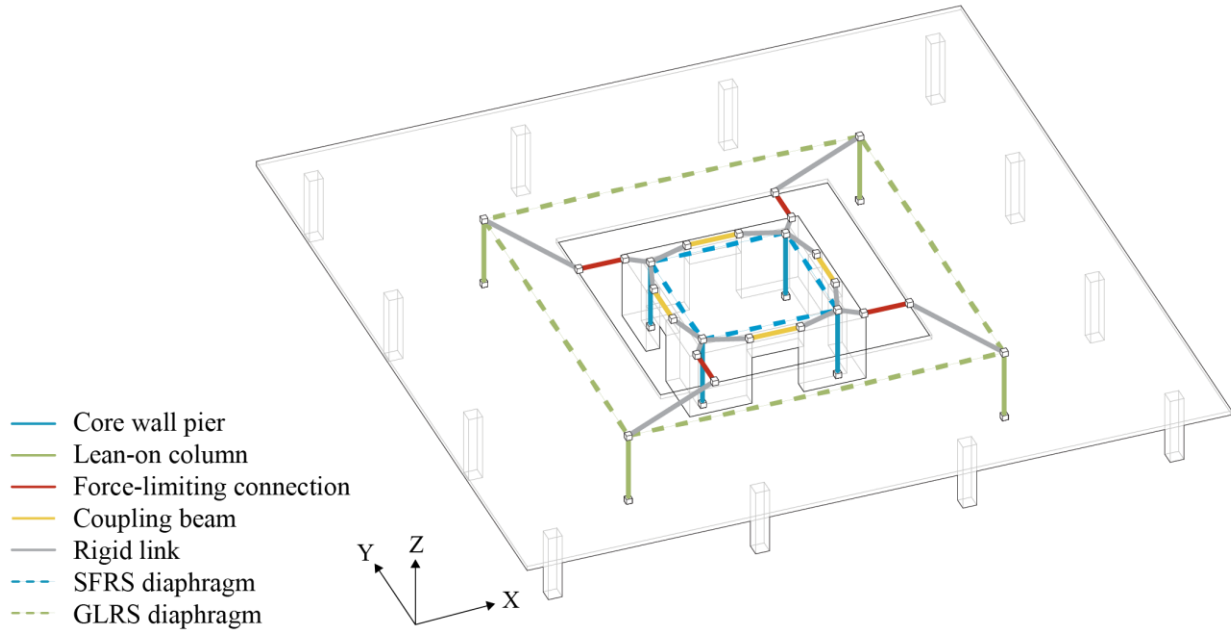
Openses model of the eighteen-story building and the elements of a typical floor
